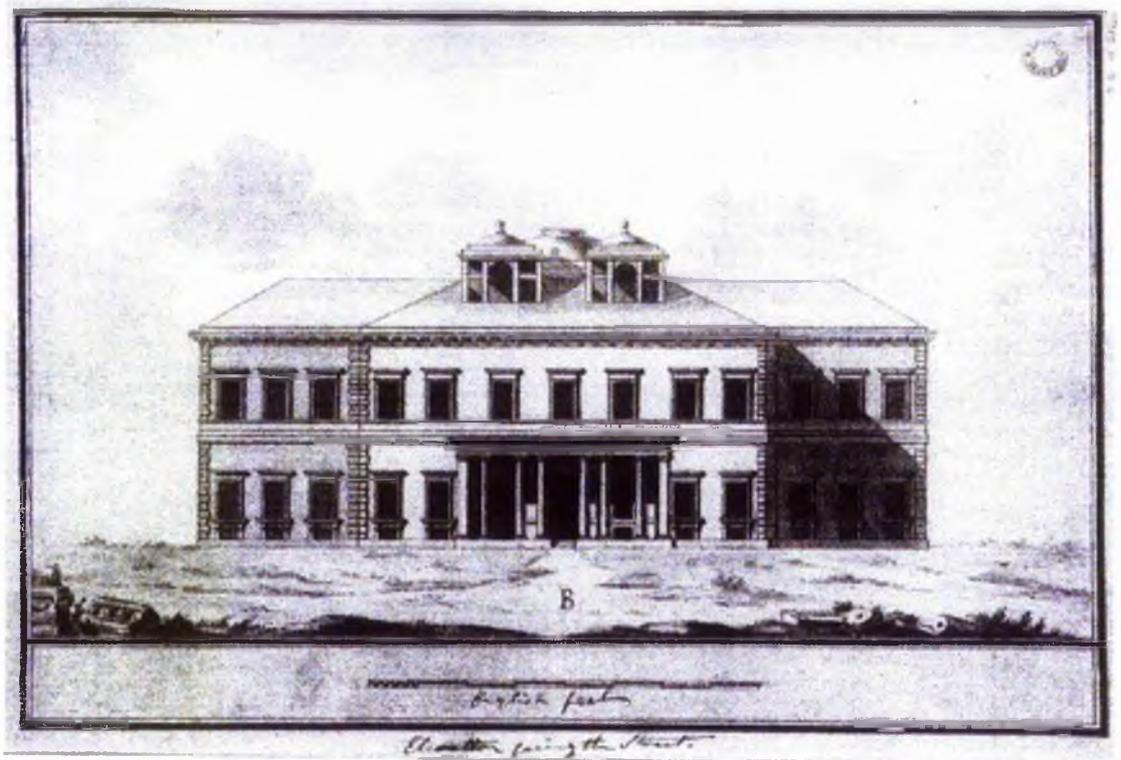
King's College. Proposed west elevation including refronting the chapel and Dr. Fraser's building. J. Byres, 1785.
